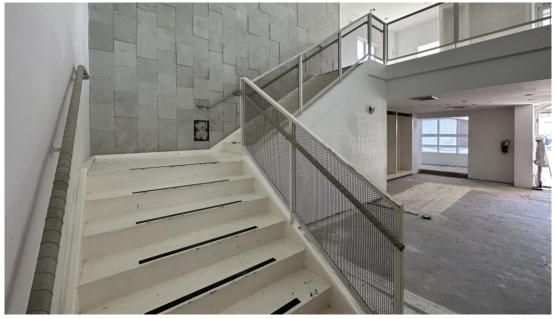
EXHIBIT (E): INTERIOR OF THE BUILDING (MAIN HALL) / PHOTO TAKEN: June 20, 2023
